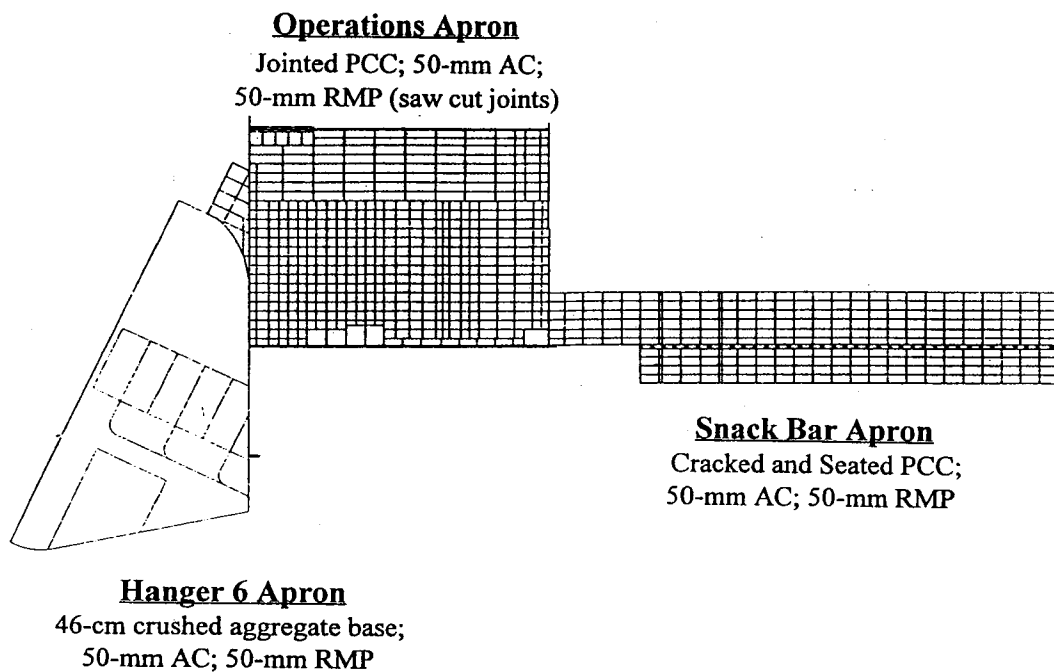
Layout of RMP parking aprons at Pope AFB
